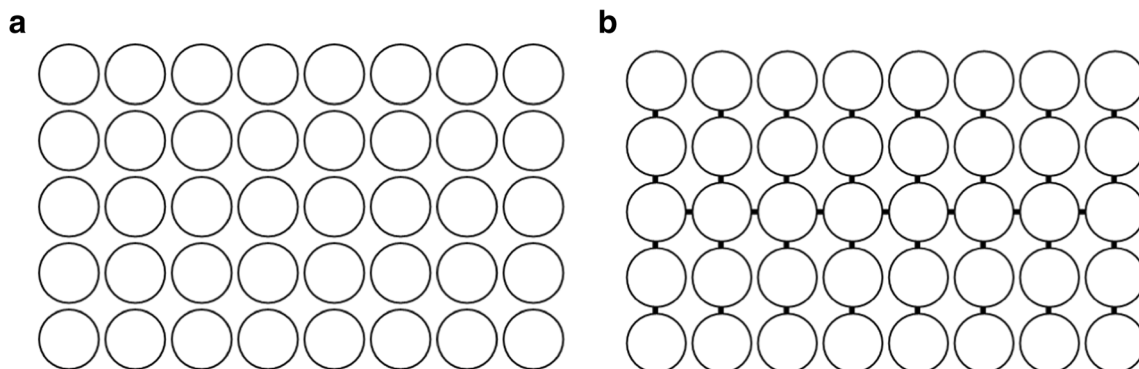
Flexible steel pad plan. a No connection. b Fishbone connection
